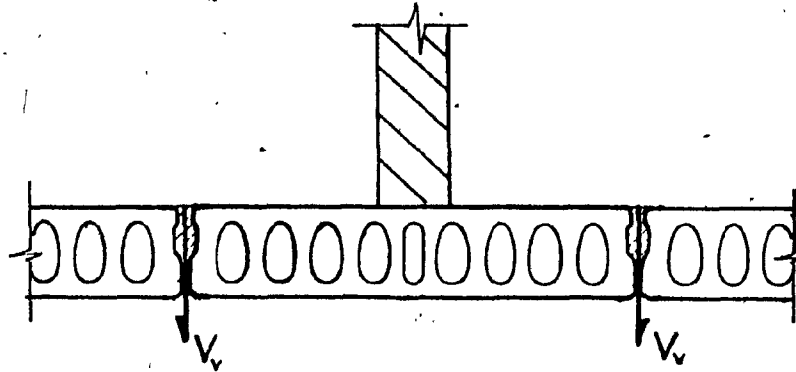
Partition Wall on Hollow-Core Slab Floor Deck.
